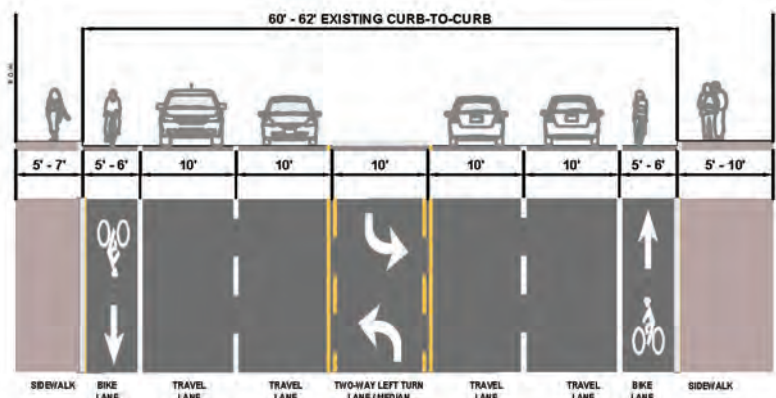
Industrial Road Existing Typical Section C (Facing North)
